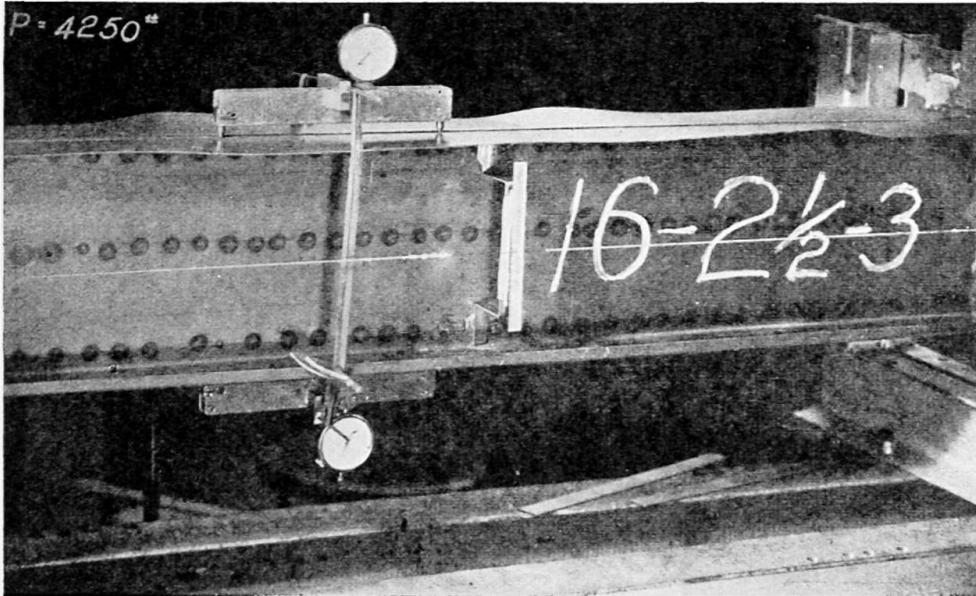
Distortion of unstiffened compression flange at load of 4,250 lb. (failure load 4,970 lb.)
